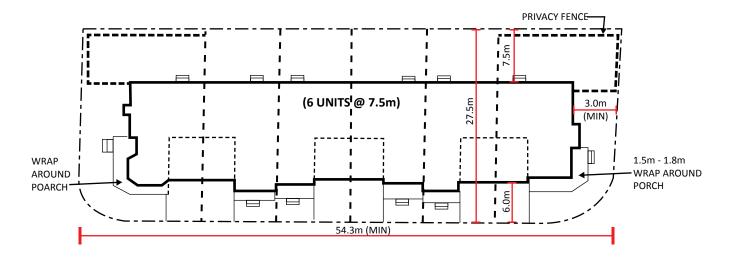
Cap-End Townhouse Block with 7.5m Units
